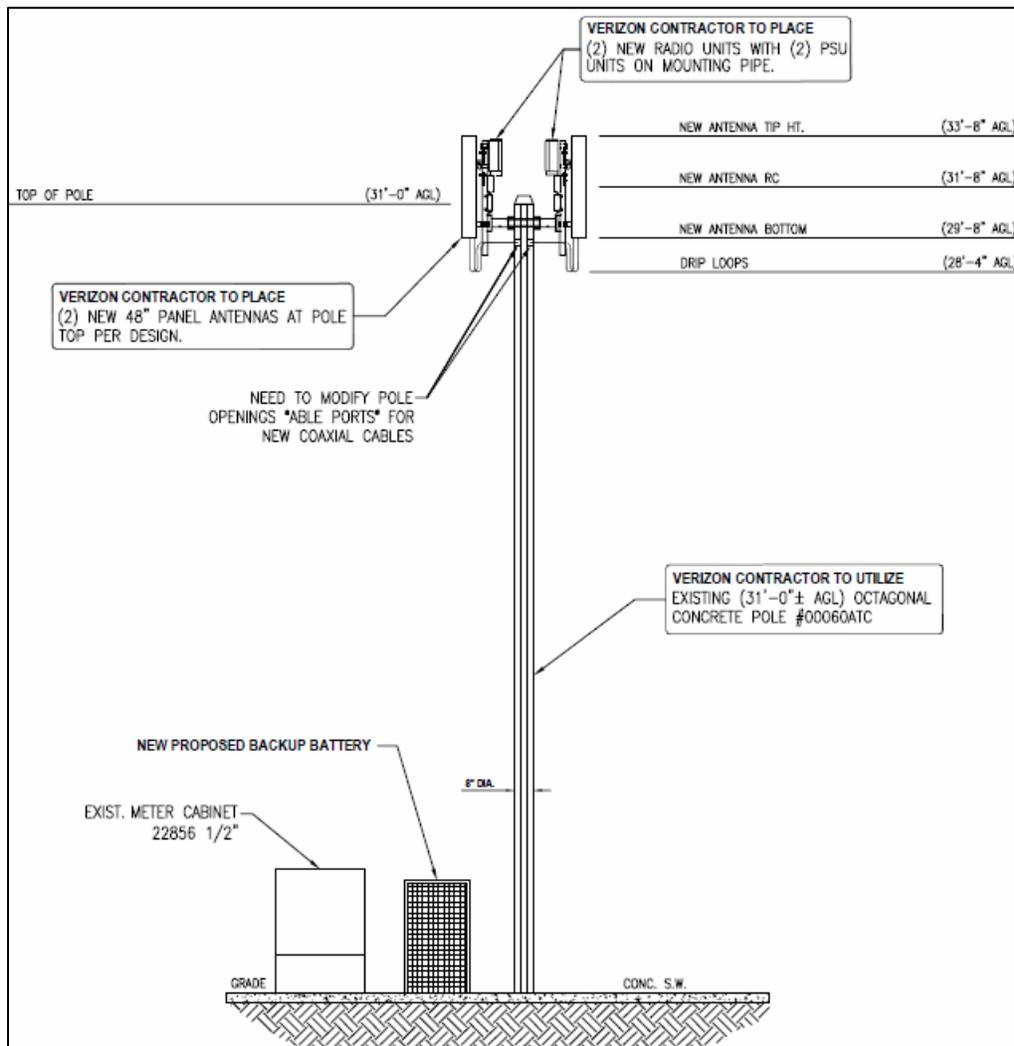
Elevation view of Pole with details (Source: Plans, Page A-4, Panel 3).
